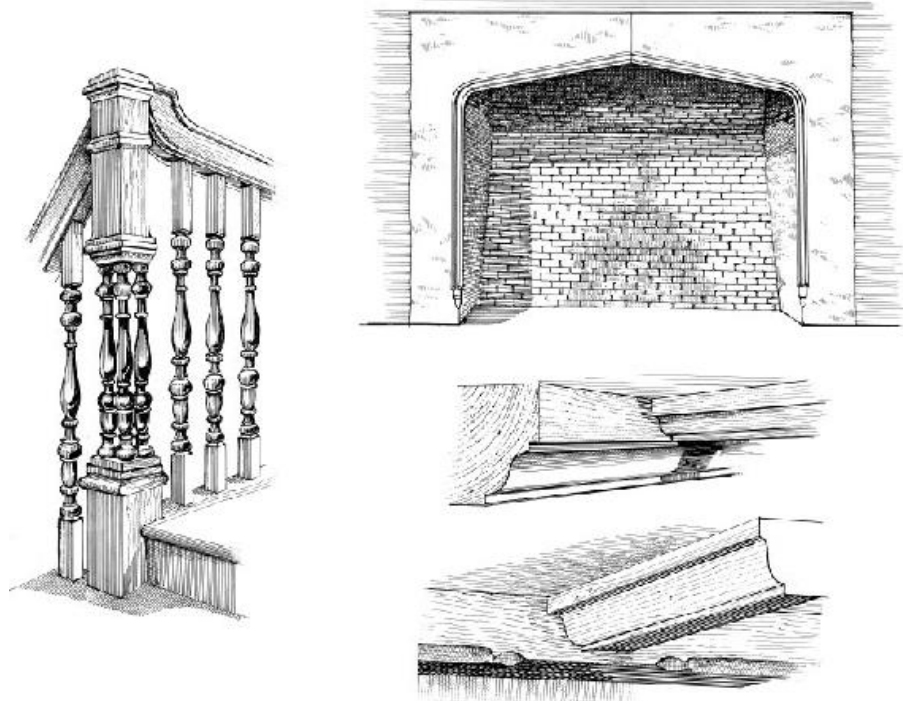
Details of staircase, fireplace and ceiling beams in the former Farmers' Club
